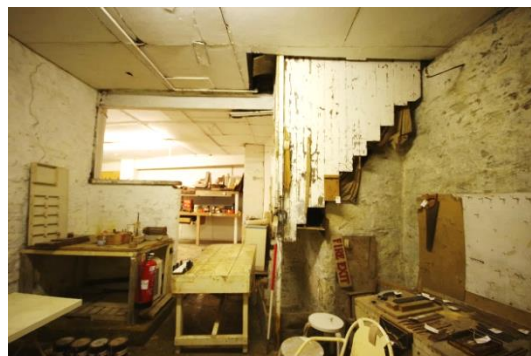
Room 9: Workshop looking west showing truncated staircase built on stone buttress.
